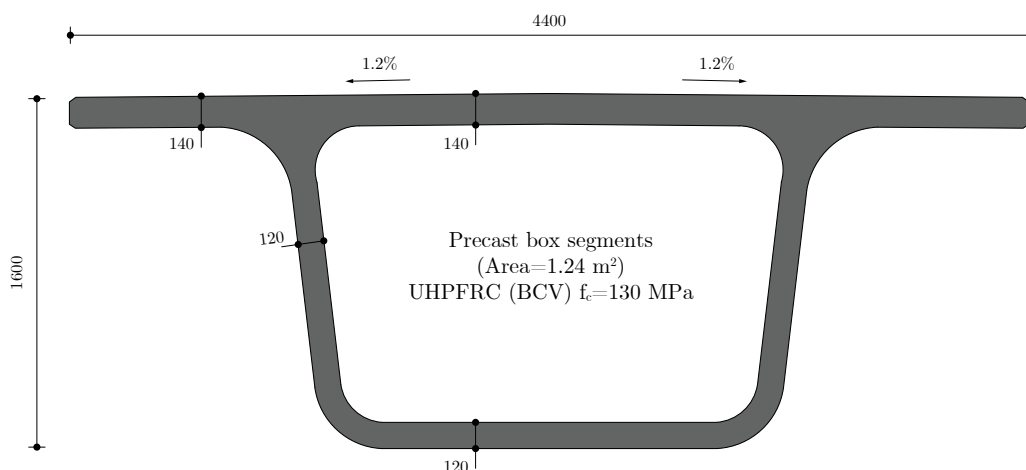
Cross-section of Chabotte Bridge. Adapted from [10].
